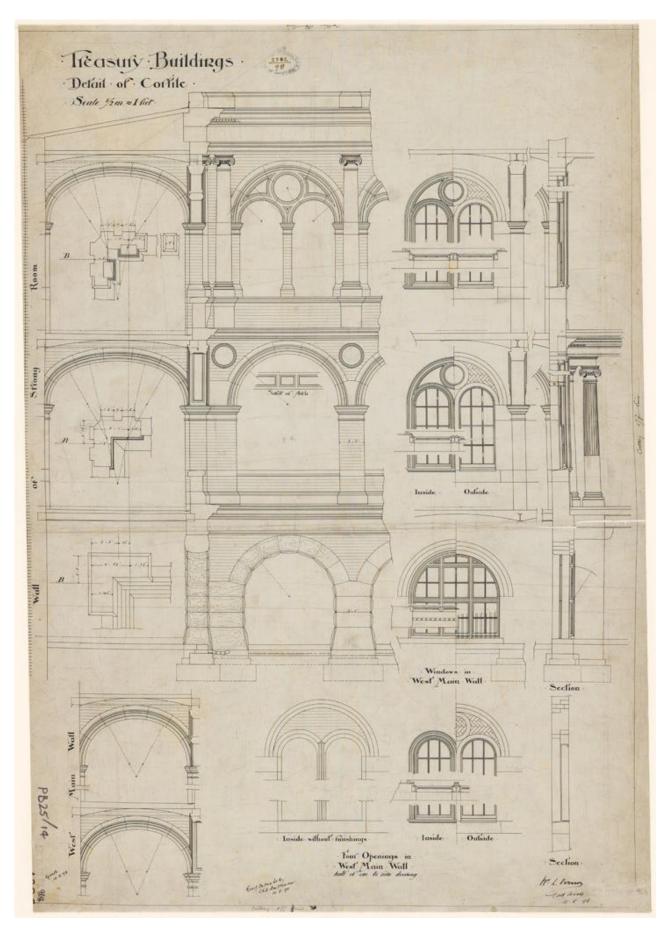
Treasury Building – Detail of Cortile (arcade) to rear of Link Building, dated 1898 Source: NSW State Records, PB25/14, 1898
